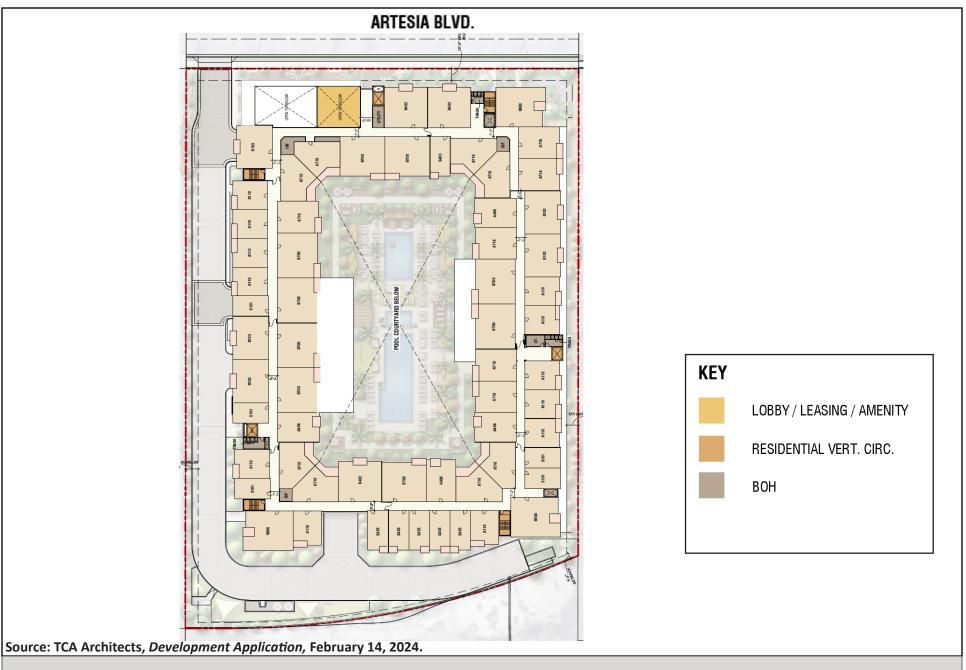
G: CONCEPTUAL SITE PLAN - LEVEL 6
